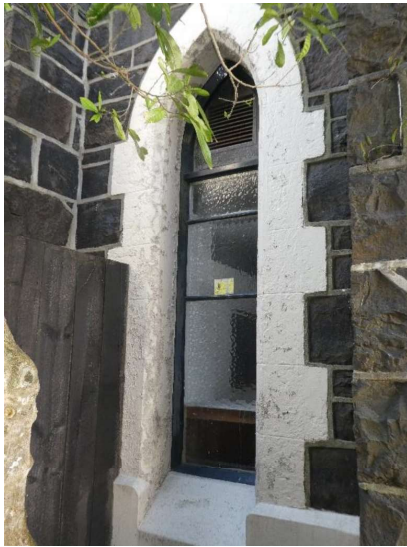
Showing the broken glazing to the steel framed windows which has been bricked up to the south western courtyard area.
